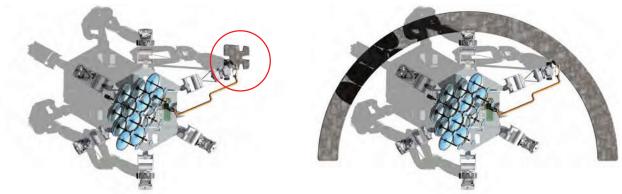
Additive manufacture of prefabricated elements -- small modular panels (left), and large beams (right) printed on the ground
